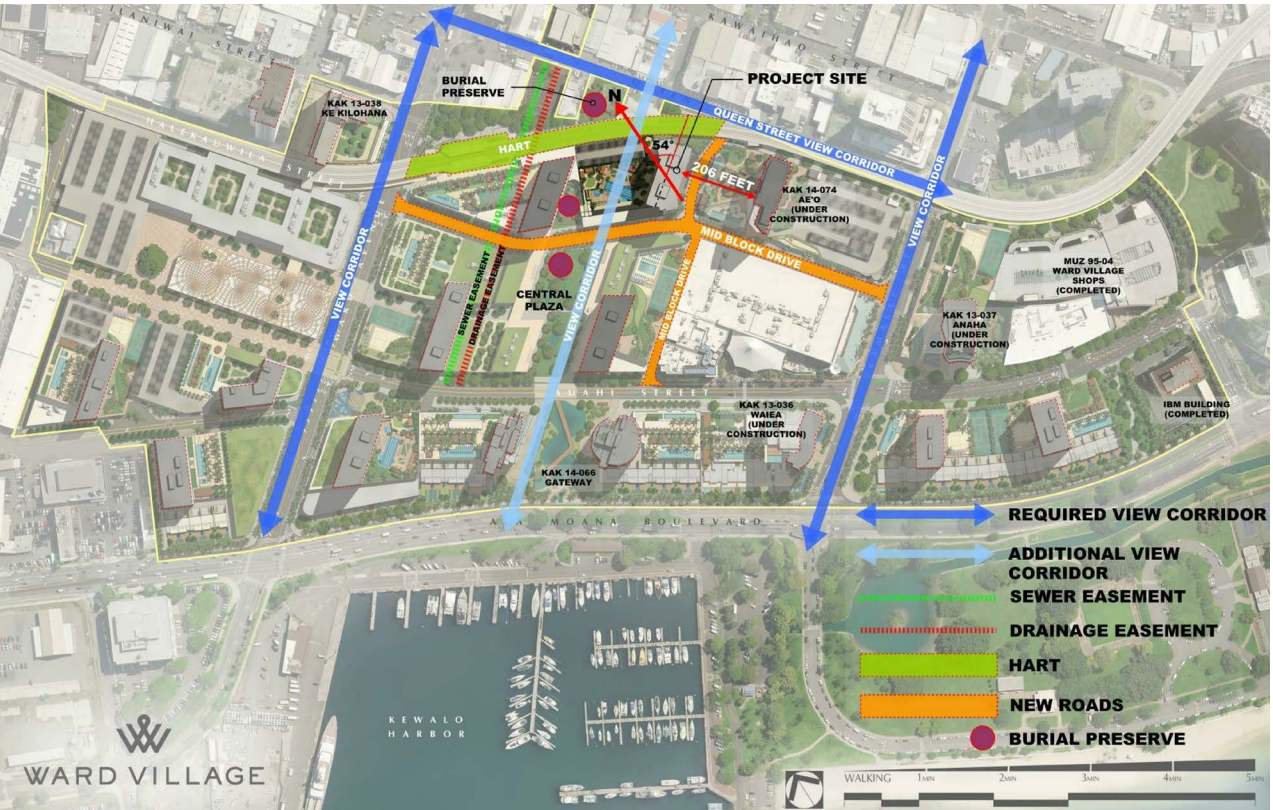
Spacing, orientation, and easements that constrain ‘A’ali’i tower spacing. See Exhibit 22 for a full-size drawing.
